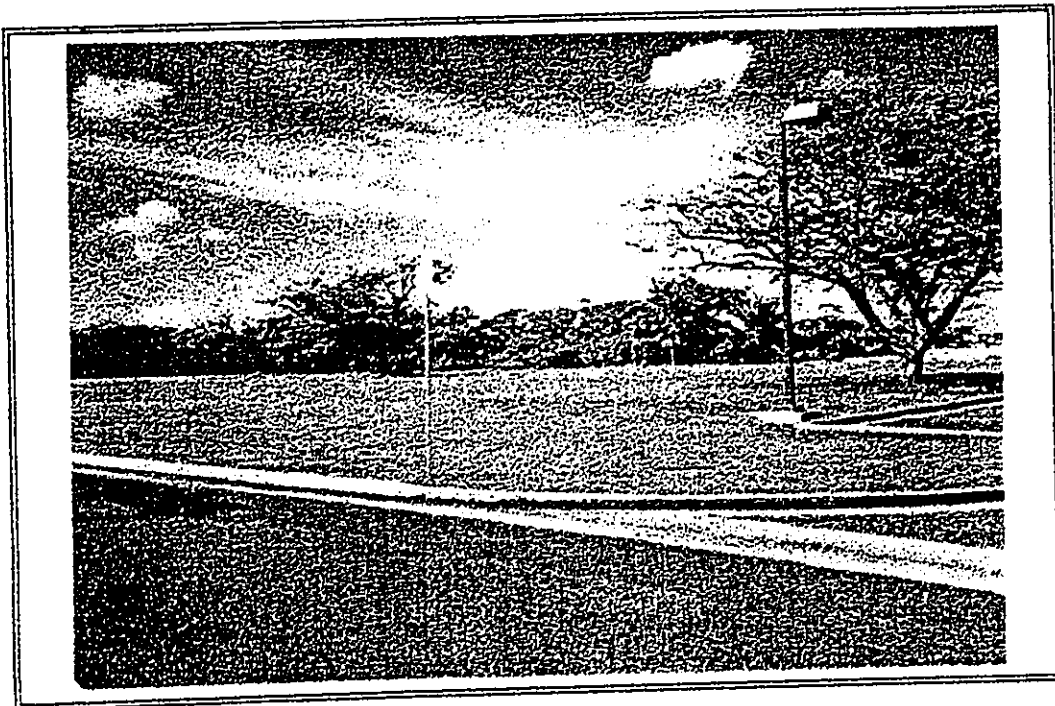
Proposed Pretreatment Facility area looking southwest. SIWWTP parking lot is on the right.
